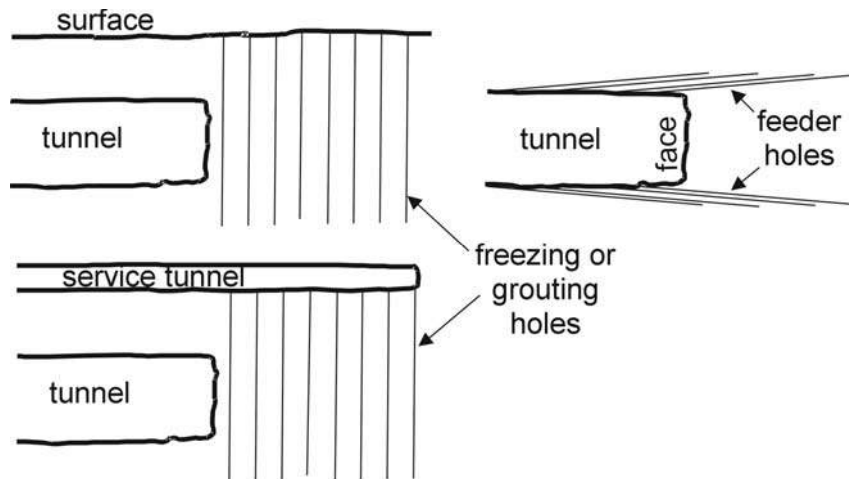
Freezing or grouting from surface, service tunnel, or feeder holes (note that the freezing and grouting holes, if cored, will also give information about ground conditions ahead of the tunnel face)
